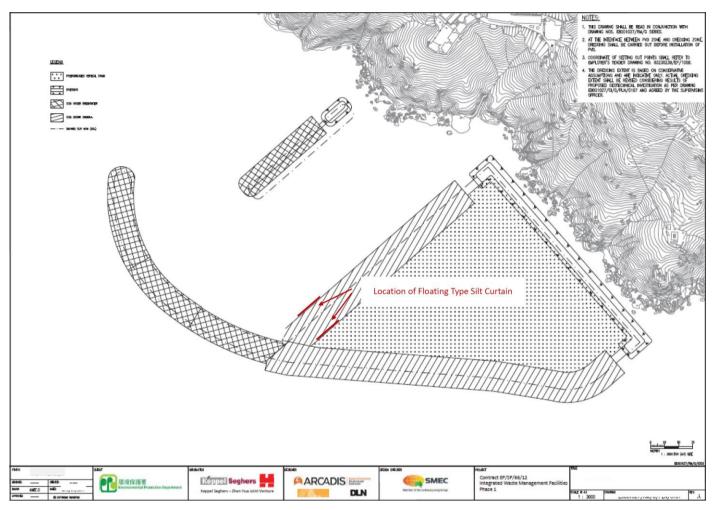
Location of Installation of Floating Type Silt Curtain
